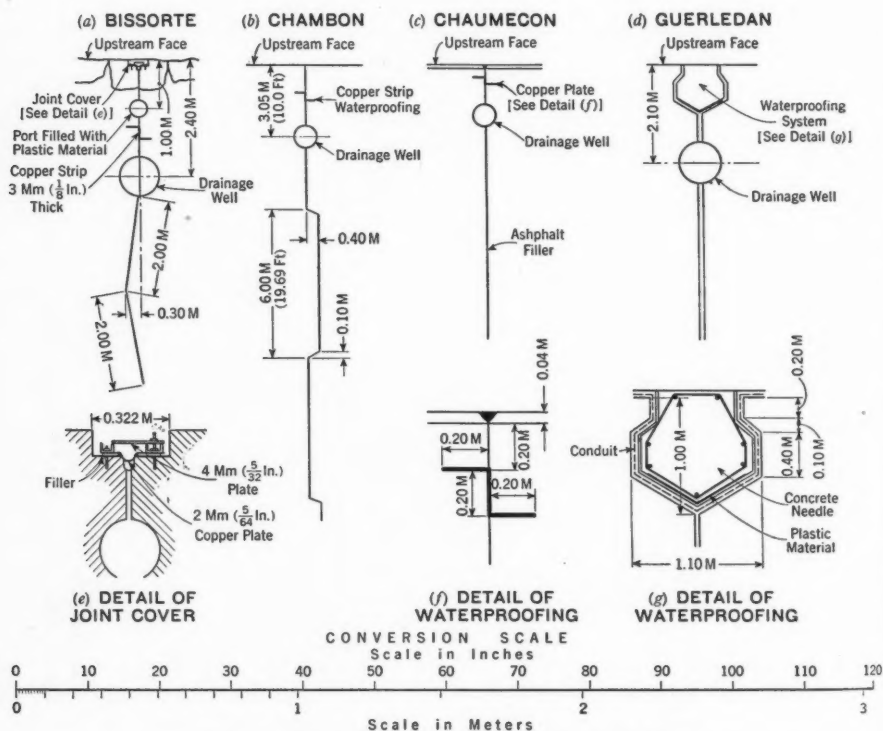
CONSTRUCTION-JOINT DETAILS FOR FRENCH DAMS
